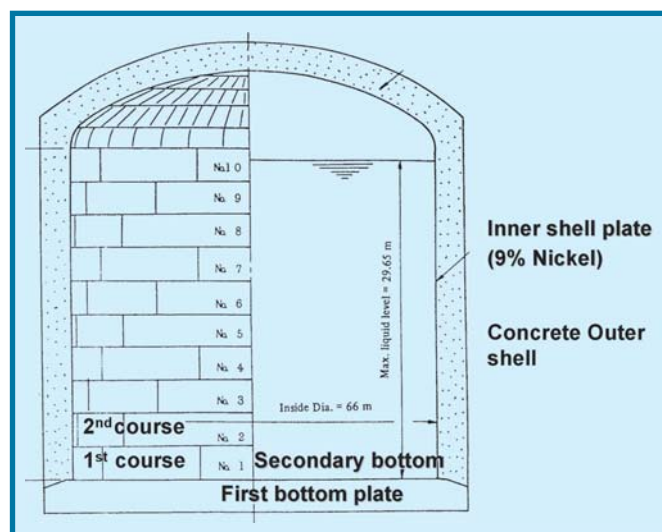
Schematic cross-section of a full containment LNG tank construction with 9% Ni steel inner shell and concrete/structural steel outer shell.
